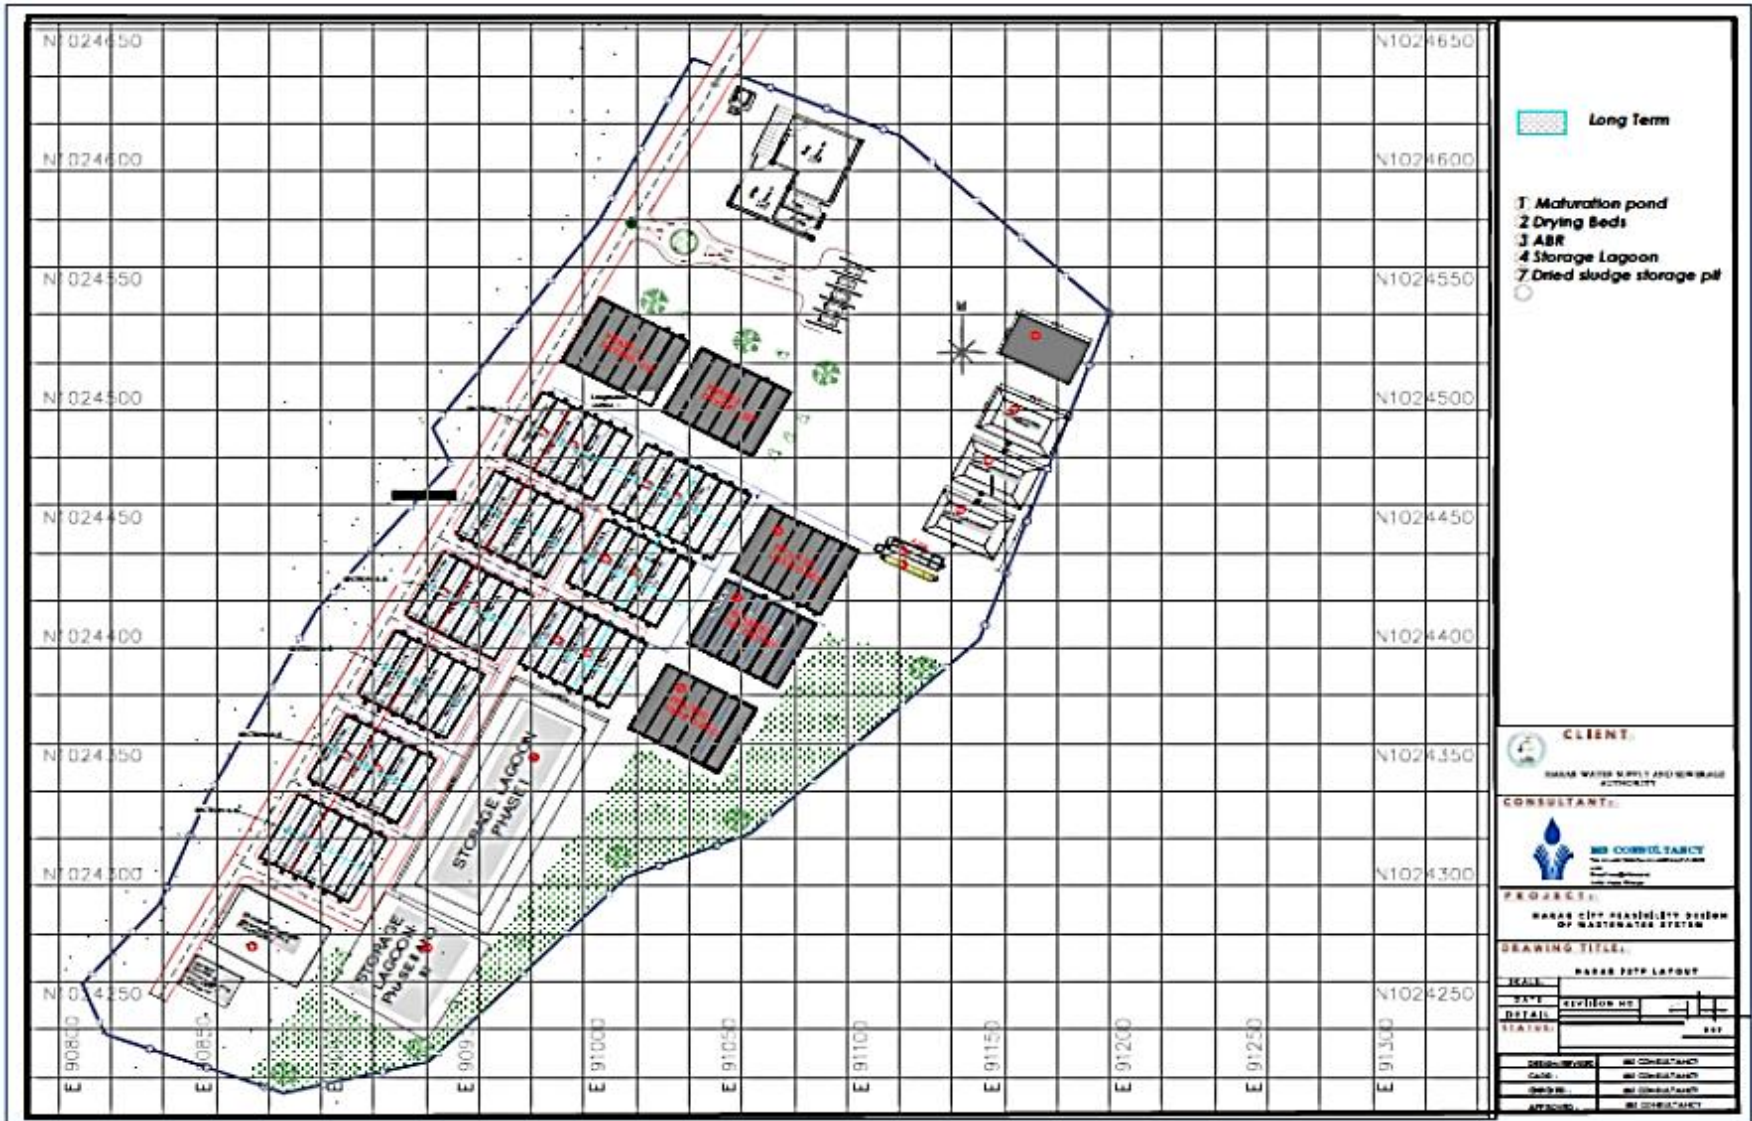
Layout of the Proposed Fecal Sludge Treatment Plant
